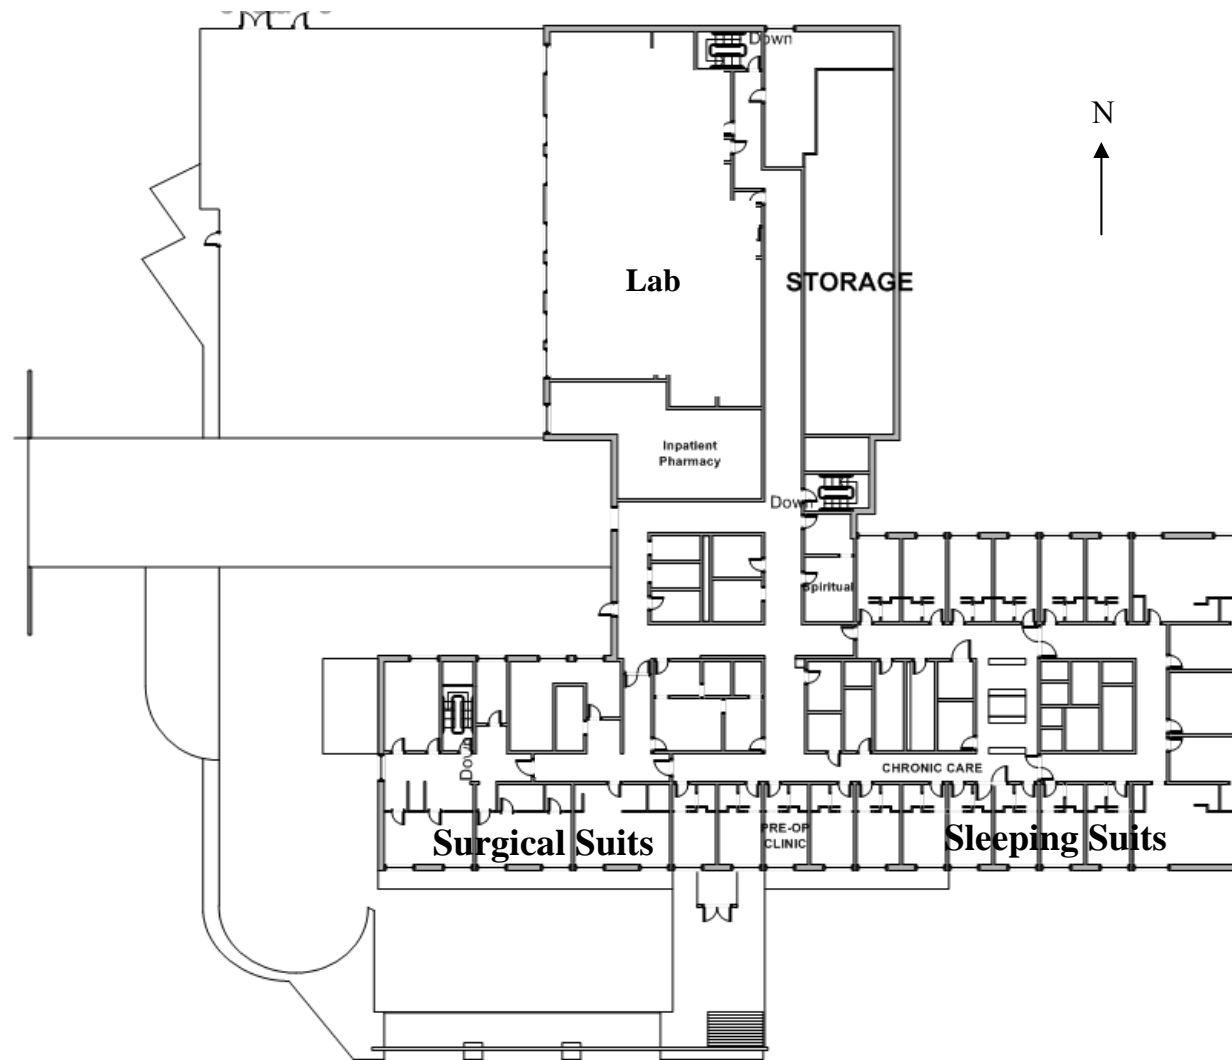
Plan view of floor 2 in hospital (not to scale)
